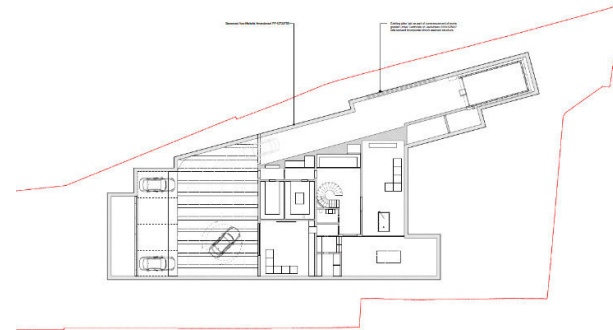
Plan view of the proposed New Construction scenario with red dashed boundary showing the initial Approved Extension proposal
